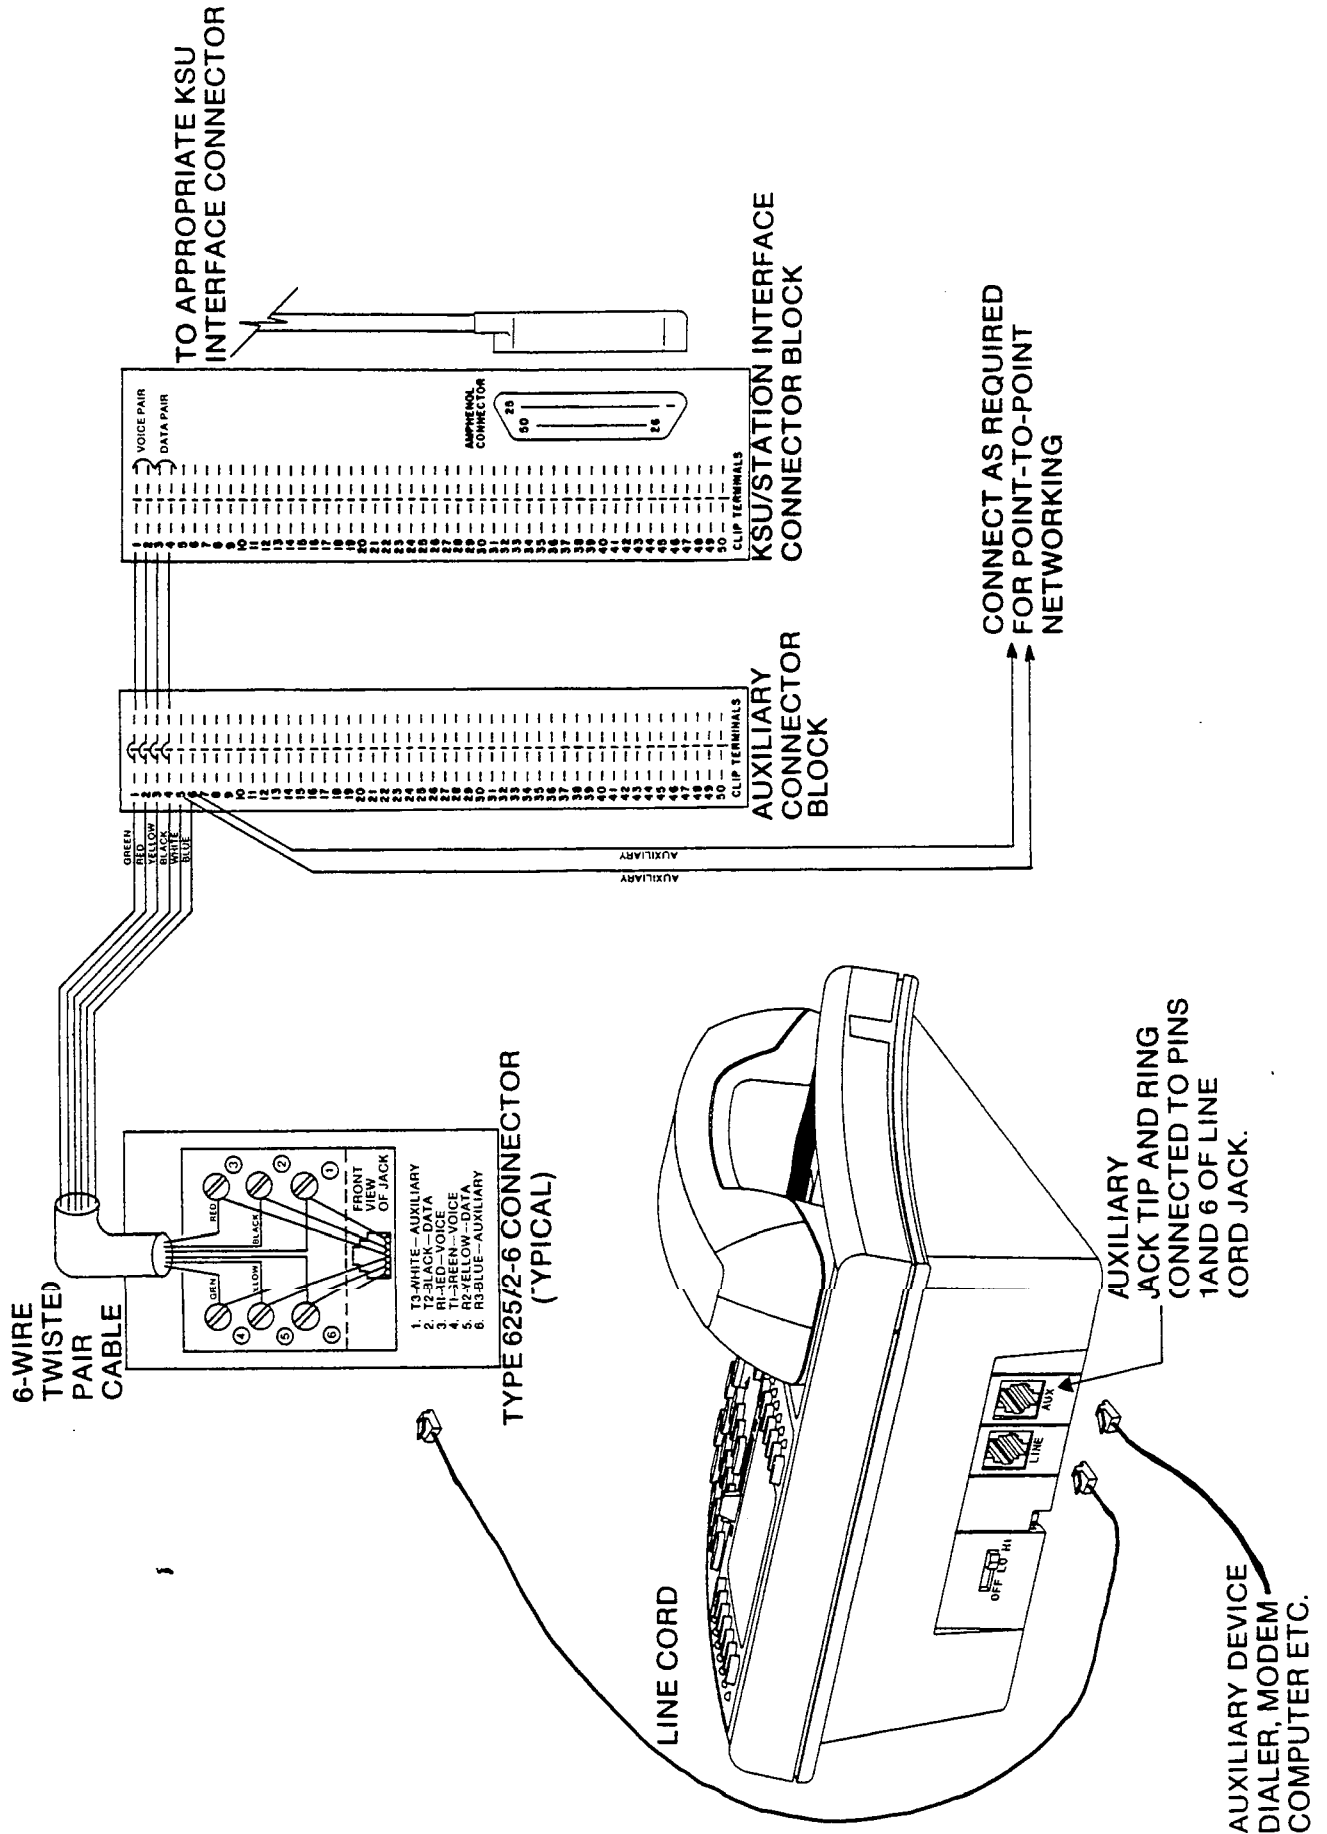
Typical 6-Wire, Auxiliary-Pair Wiring
